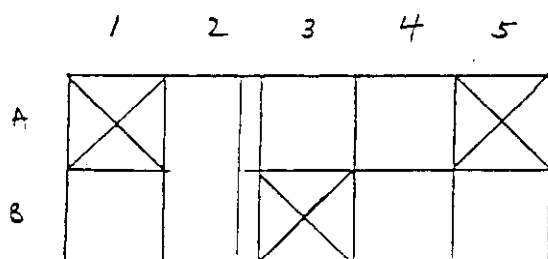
Survey Grid Locations, Building 8 Office Auxiliary Area -- Supervisor's Office -- Room Y
